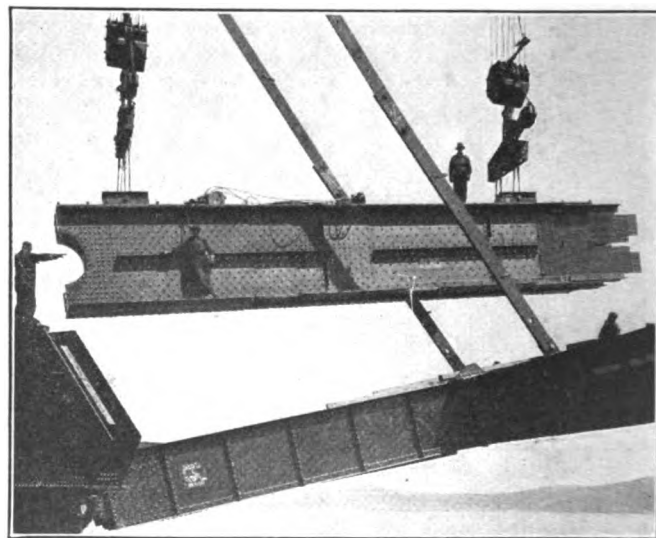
SWINGING ONE OF THE BOTTOM CHORD PIECES INTO PLACE
